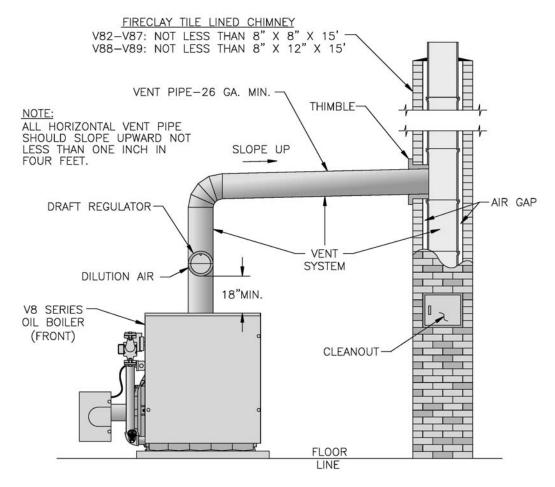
Recommended Vent Pipe Arrangement and Chimney Requirements
